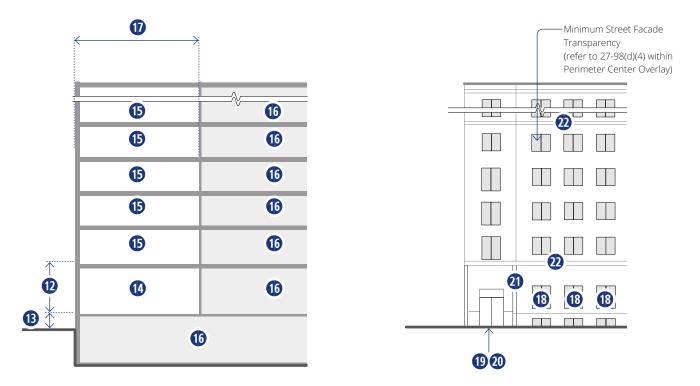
General Building: Floor-to-Floor Height & Use Requirements
